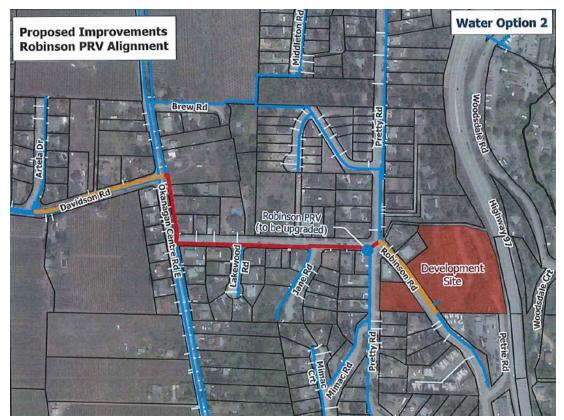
Plan of the Water Upgrades - Artela Drive to 11474 Petrie Road (Development Funded)
